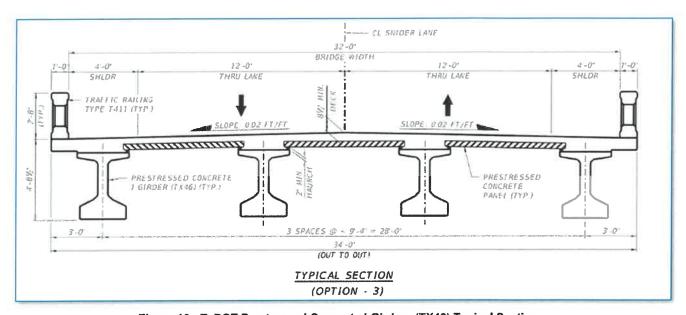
TxDOT Prestressed Concrete I-Girders (TX46) Typical Section
